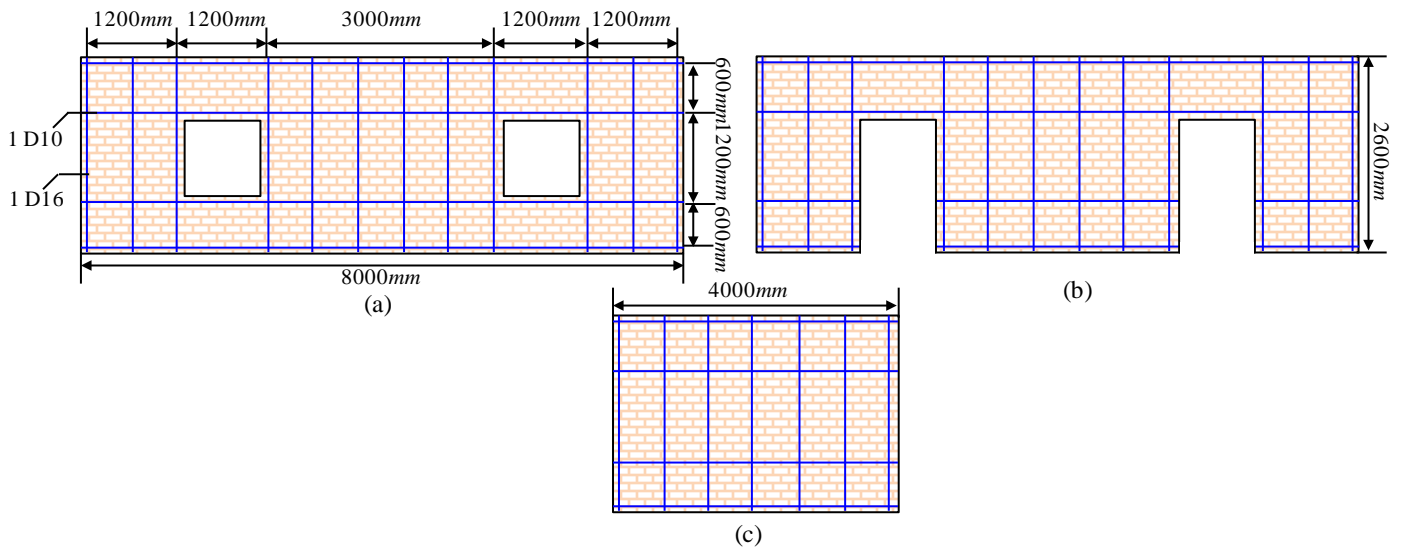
Structural detail; (a) Wall A; (b) Wall B; (c) Wall C
